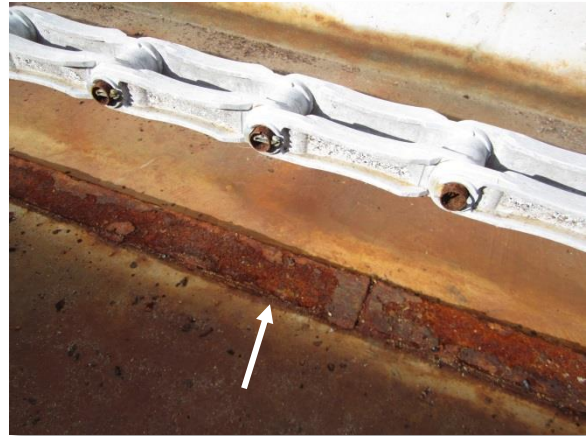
Apparent corrosion of floor tracks for skimmer system.
